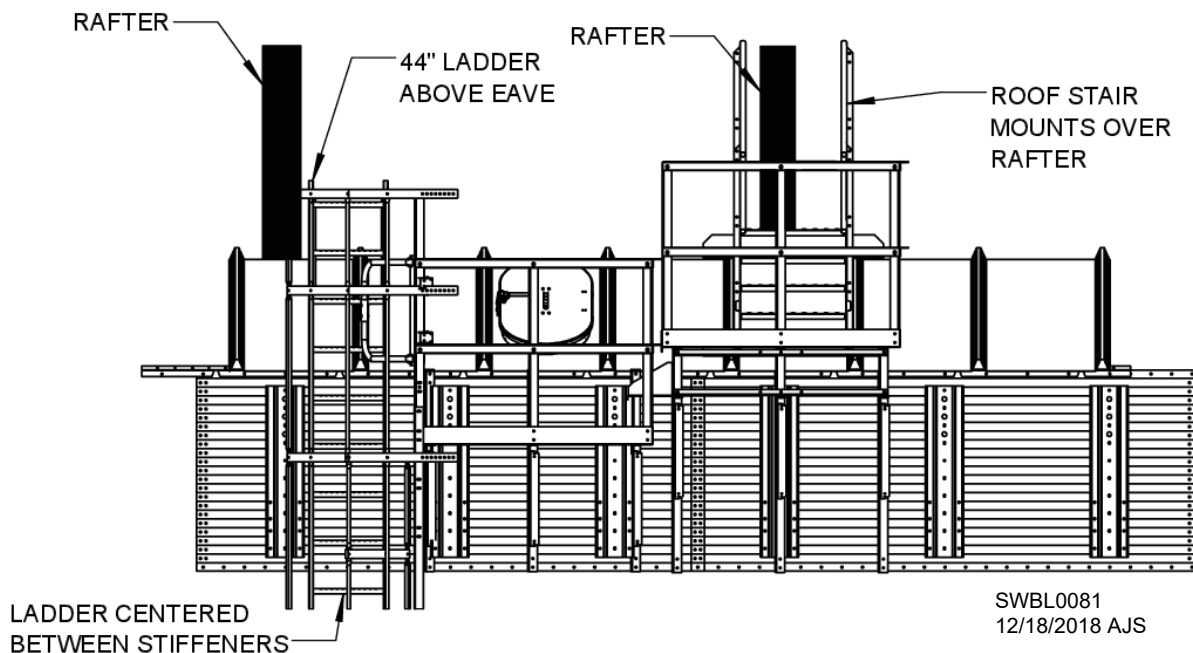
Ladder & platform locations with 3 stiffeners & 4 roof sheets per sidewall sheet
